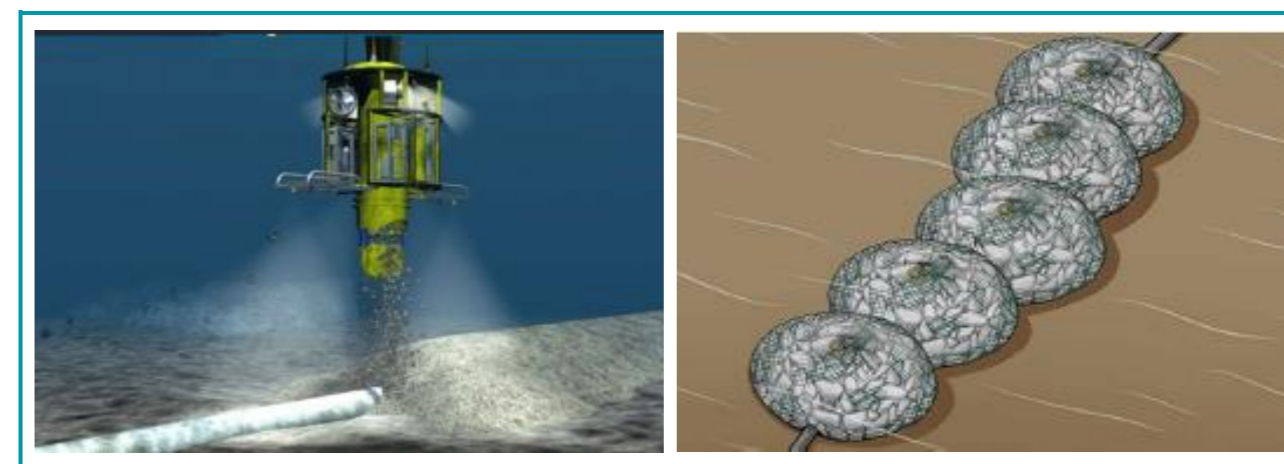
Rock Cable Protection Methods (Left: Rock Placement; Right: Rock Bags)
